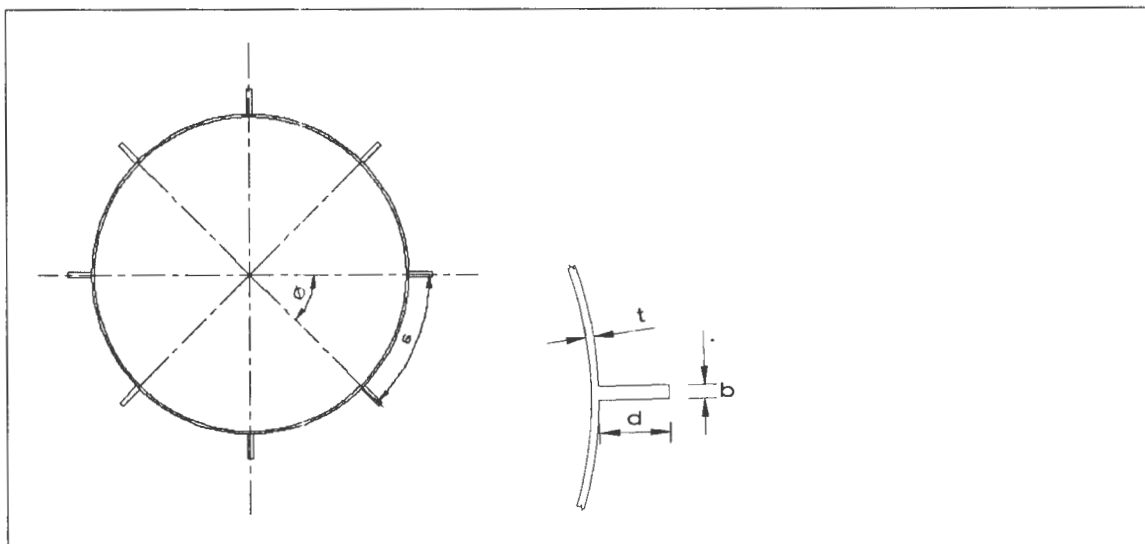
11 Stiffened cylinders and stiffener geometry
